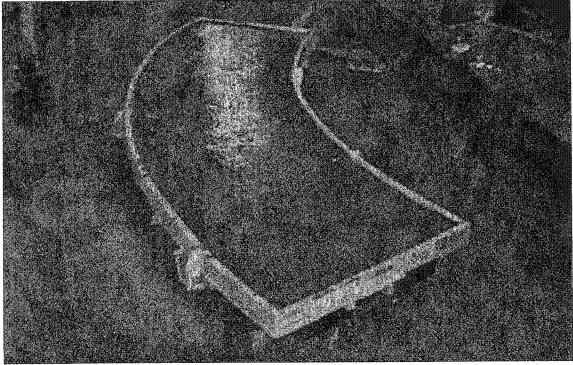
View of Bridge Model M2 after pouring and finishing the concrete slab
